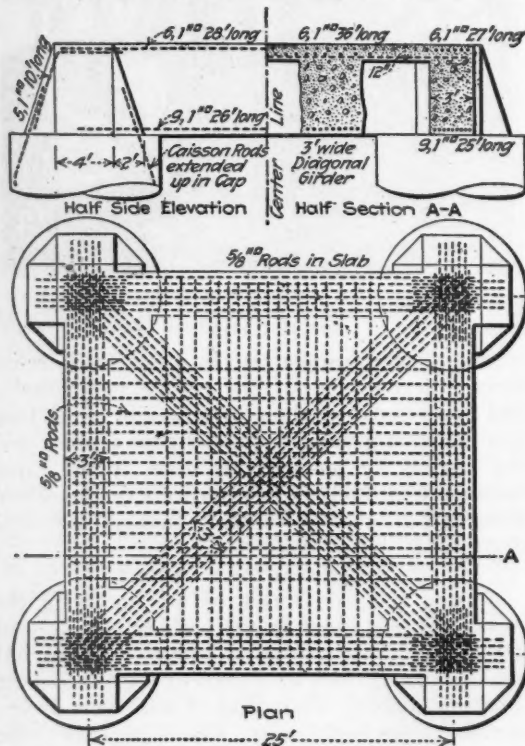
REINFORCED CONCRETE CAP FOR PIERS.
